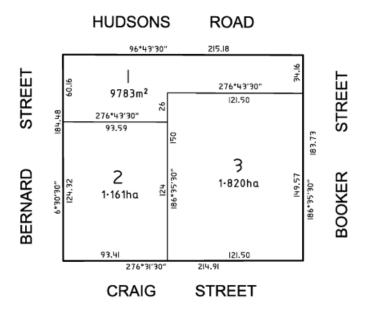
Plan of subdivision, Source: Application documents (PA220336)
